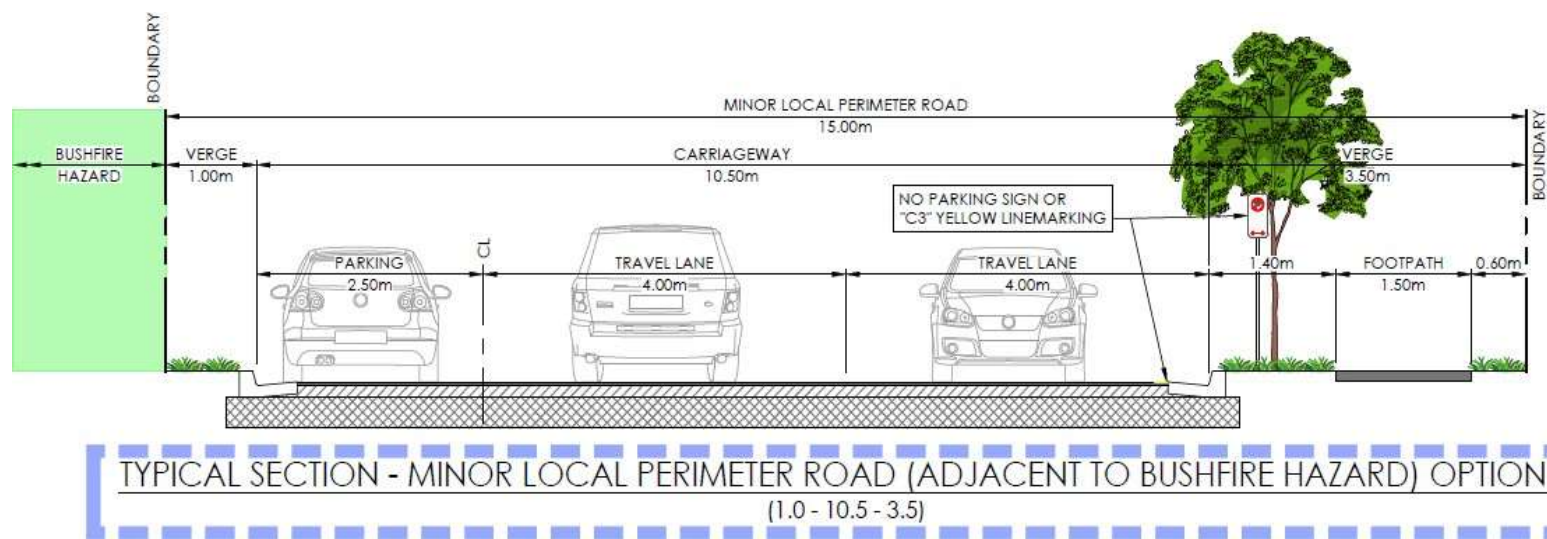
Minor Local Perimeter Road (Adjacent to Bushfire Hazard / District Park 1 & 2)
